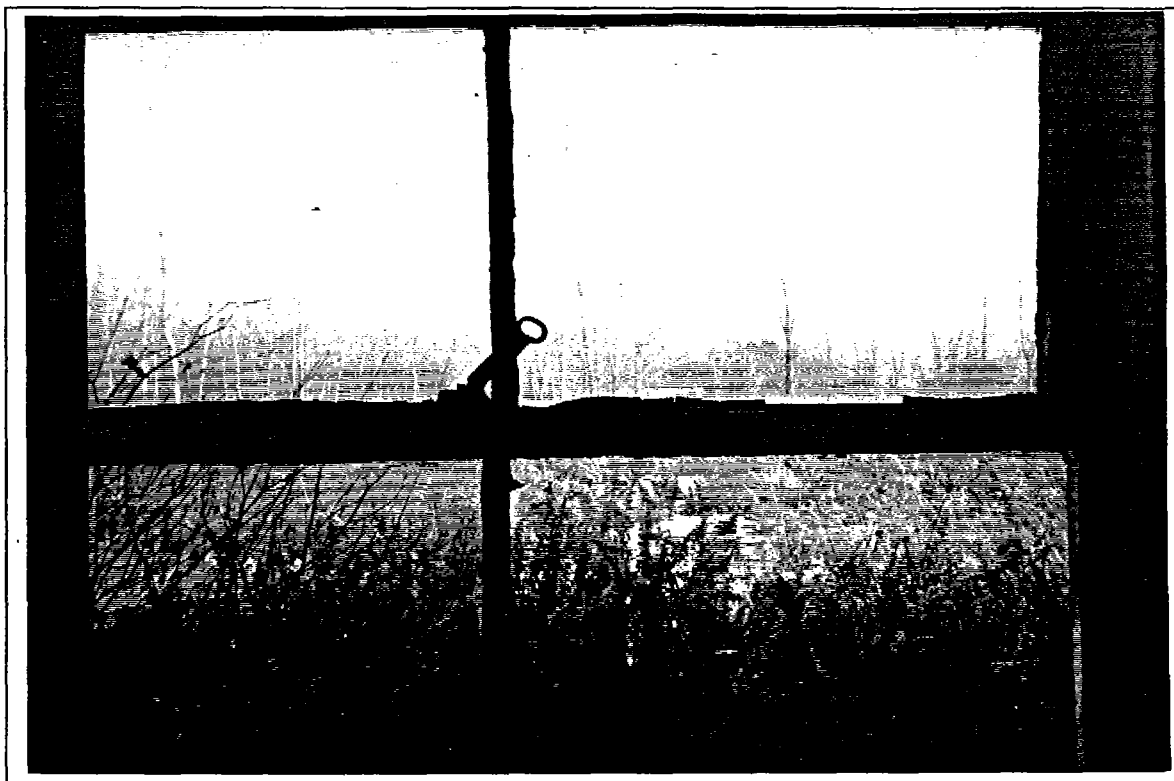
Building 27 - Sampling point where Sample No. 1-037 was taken.
